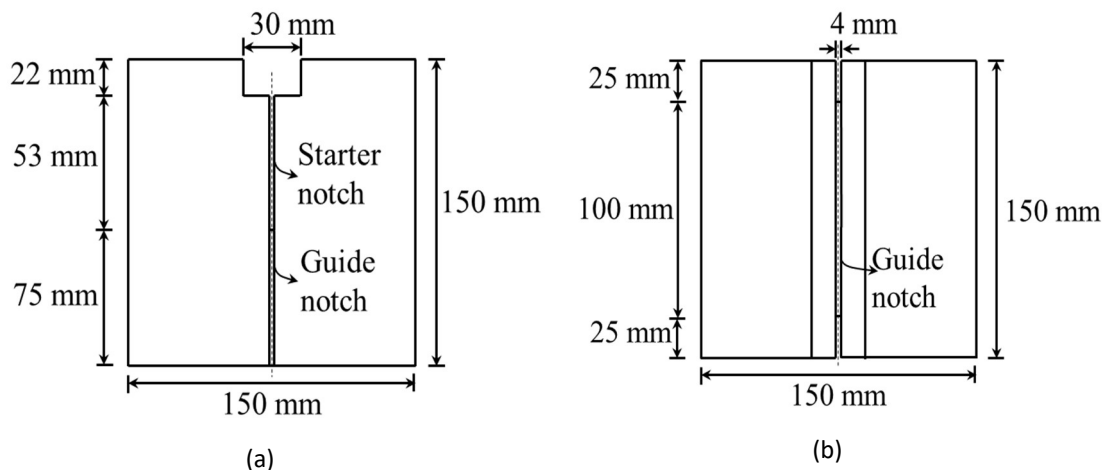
Specimens' geometry: front view (a); top view (b) as per NT BUILD 511 (N.BUILD, 2005).
